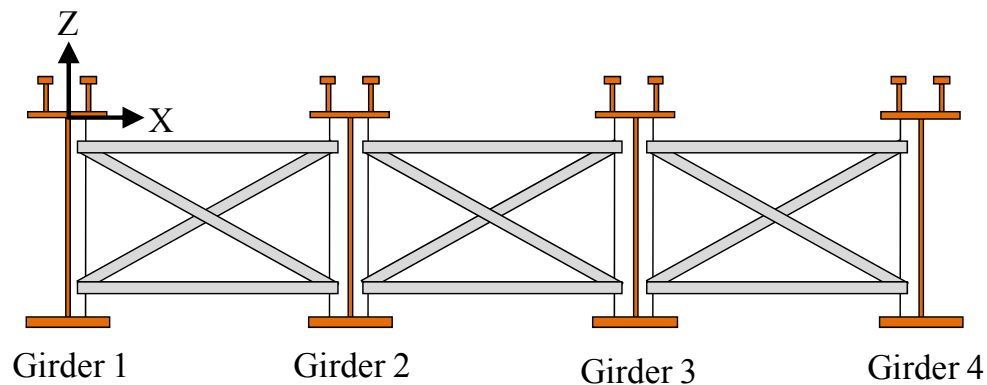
Typical Bridge Cross Section Looking Ahead Station
